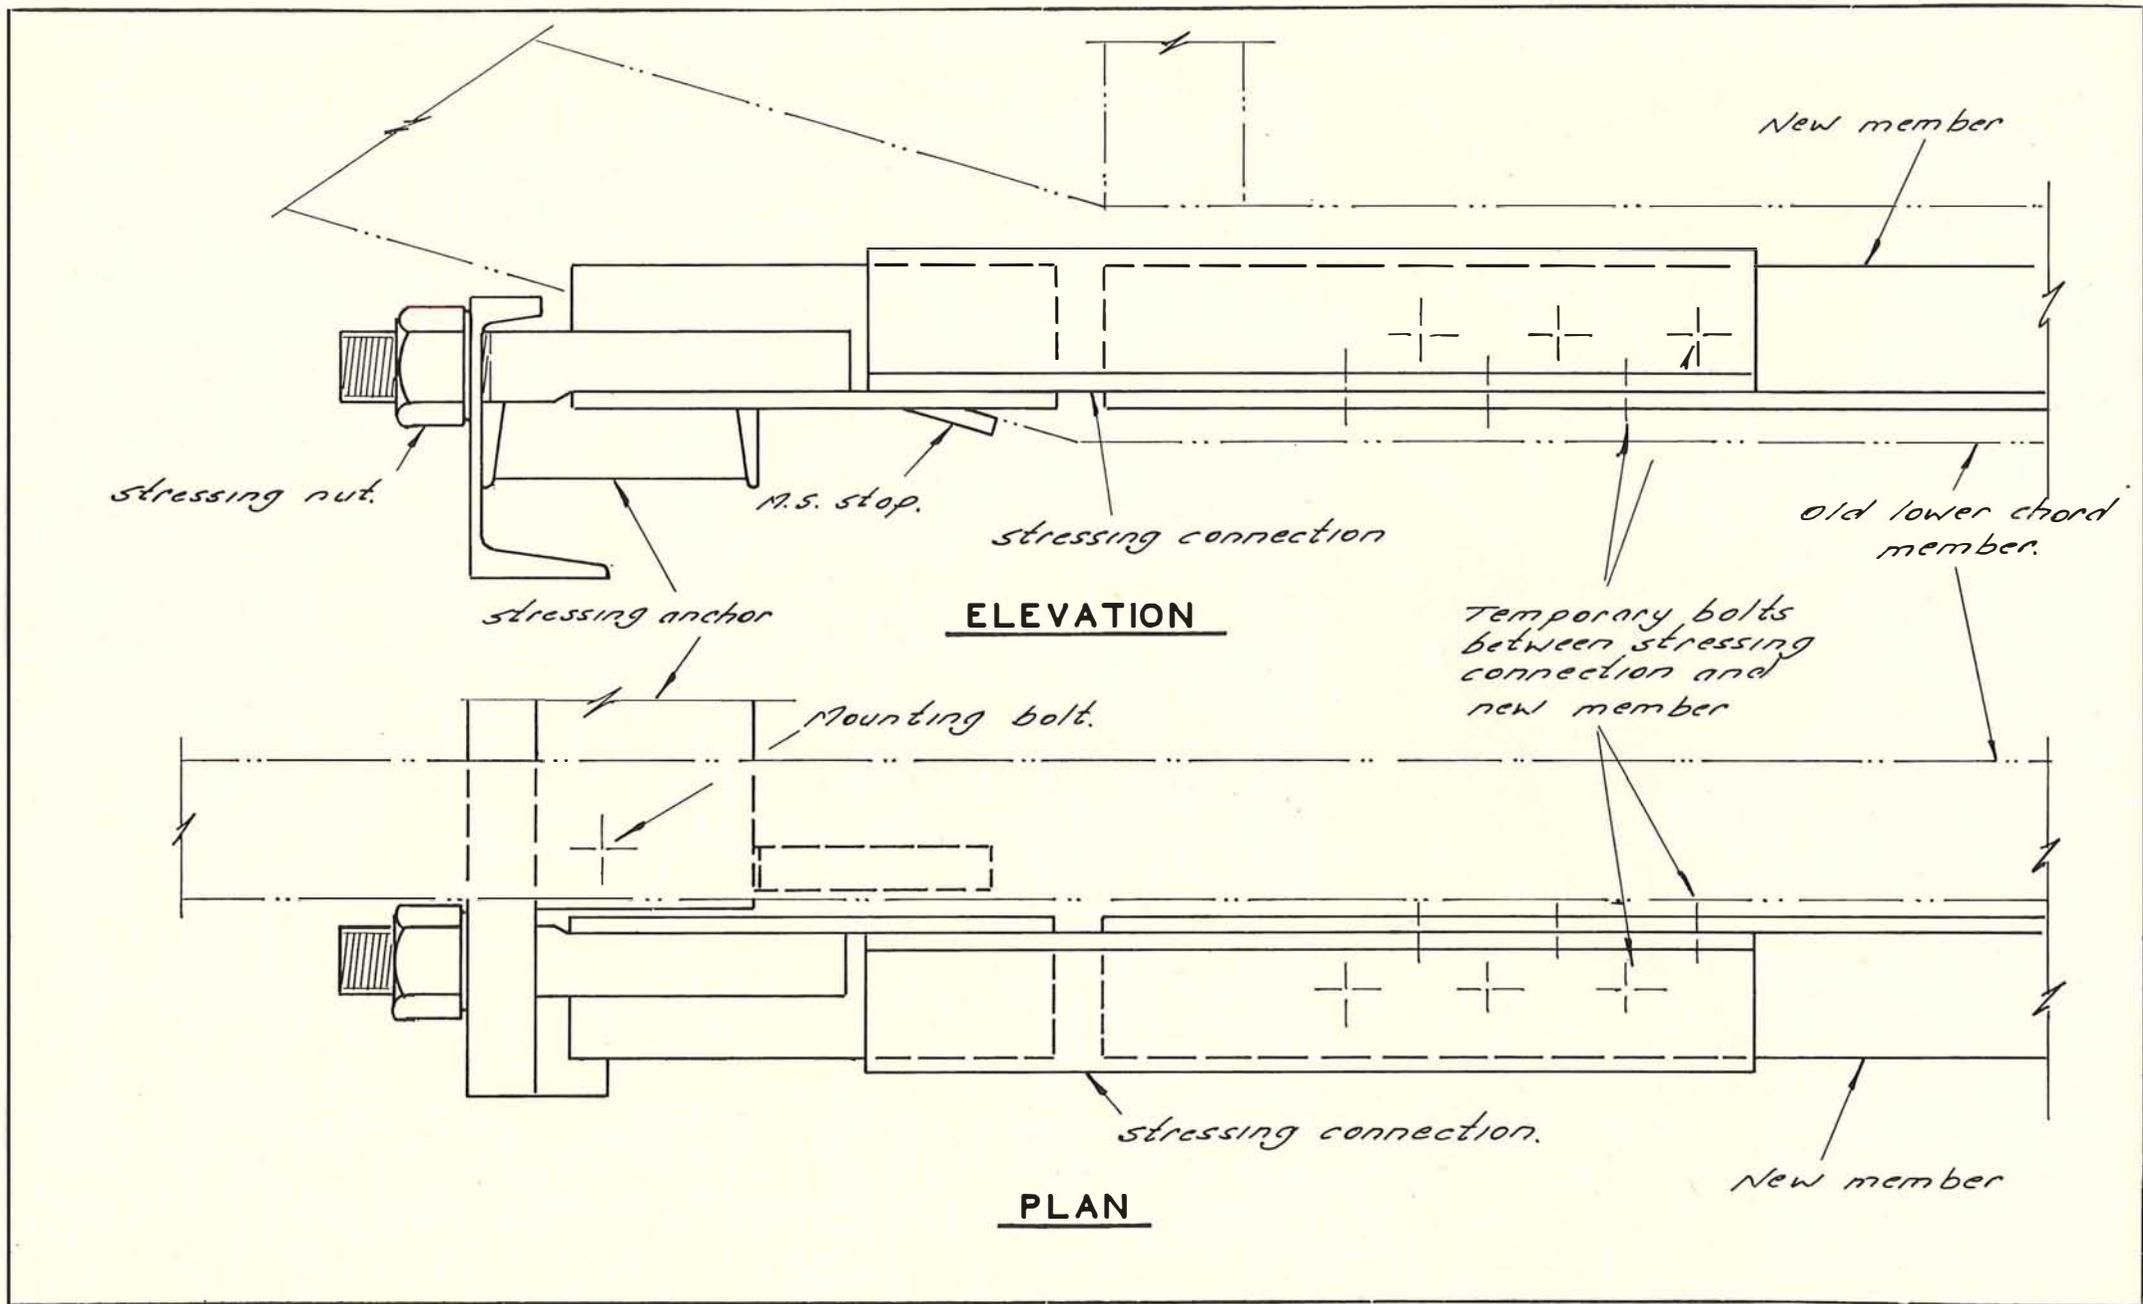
Arrangement for prestressing new strengthening member at Bemm River Bridge.
